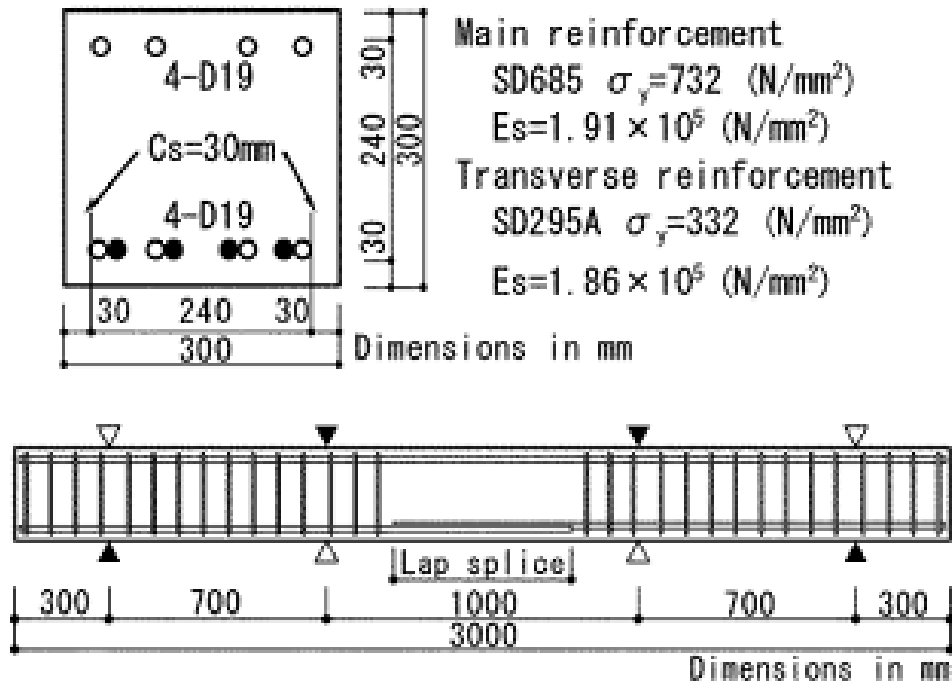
Dimensions and reinforcement details of the splice beam specimens (Morohashi *et al.*, 2007)
